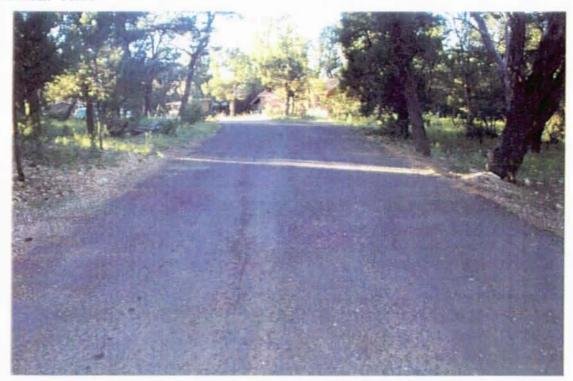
MP 0.24 - End at Route 409, Looking Backwards.
